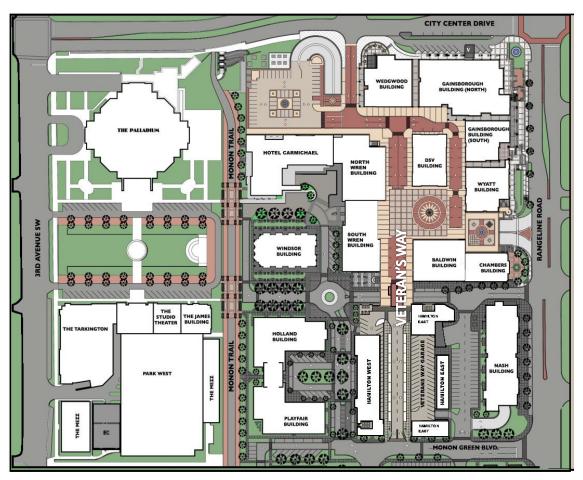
City Center Master Plan, provided by Pedcor City Center Development Company
